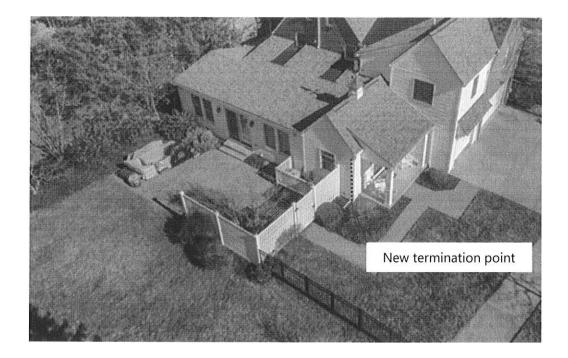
Aerial view highlighting the proposed fence's termination point near the southwest corner of the home's side entry, replacing the previous connection to the vinyl fence.
